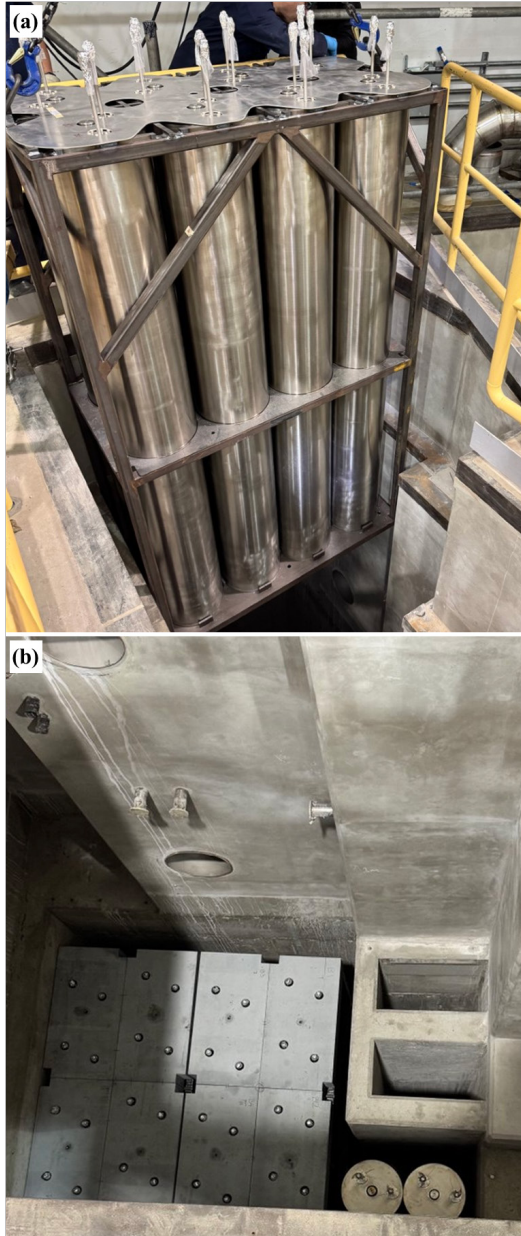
(a) Decay storage tank installation; and (b) decay tanks with shielding blocks.
